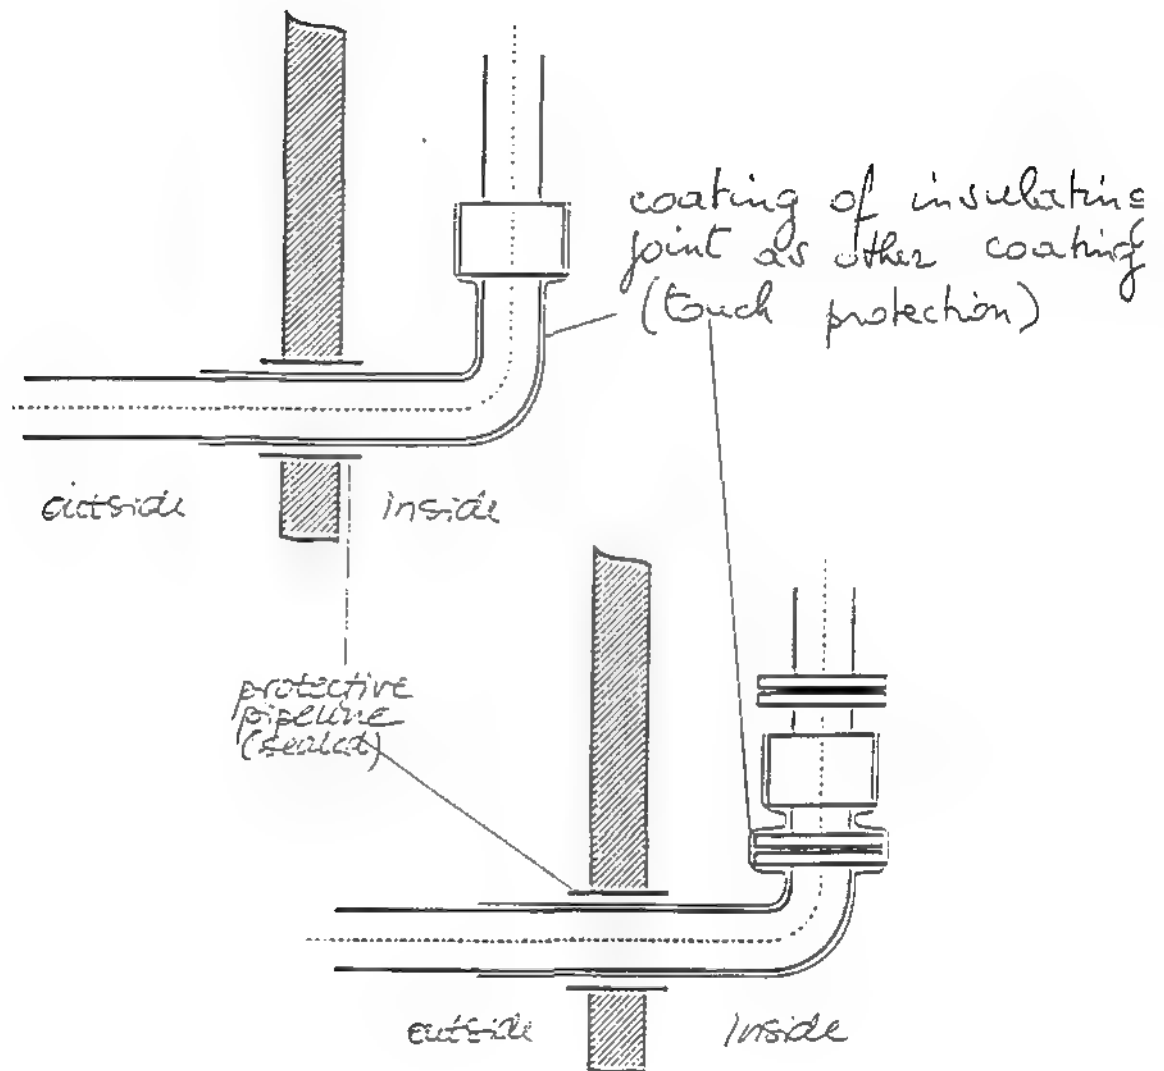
Insulating joints in house-connection line; house-connection line made of steel
